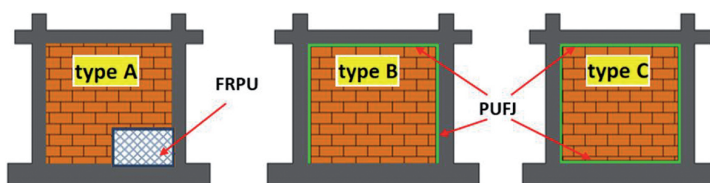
Schemes of tested reinforced concrete frames with infill walls: type A (rigid connection with mortar) without and with FRPU reinforcement (left), type B with injection PUFJ on 3 edges (in the middle), type C with prefabricated PUFJ on 4 edges (on the right)
